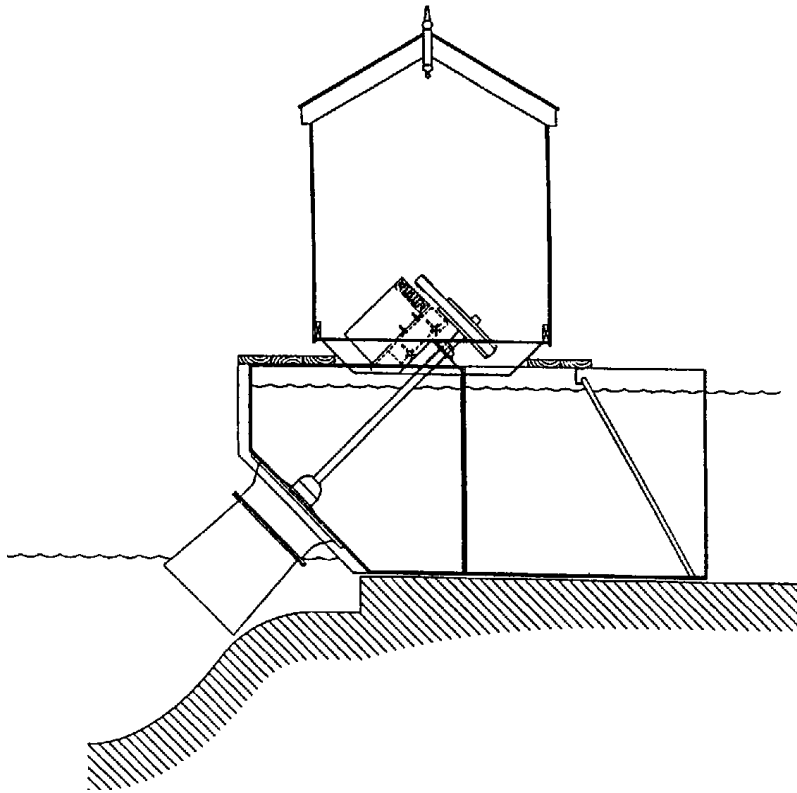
Low-head propeller turbine system, Evans Engineering Ltd
